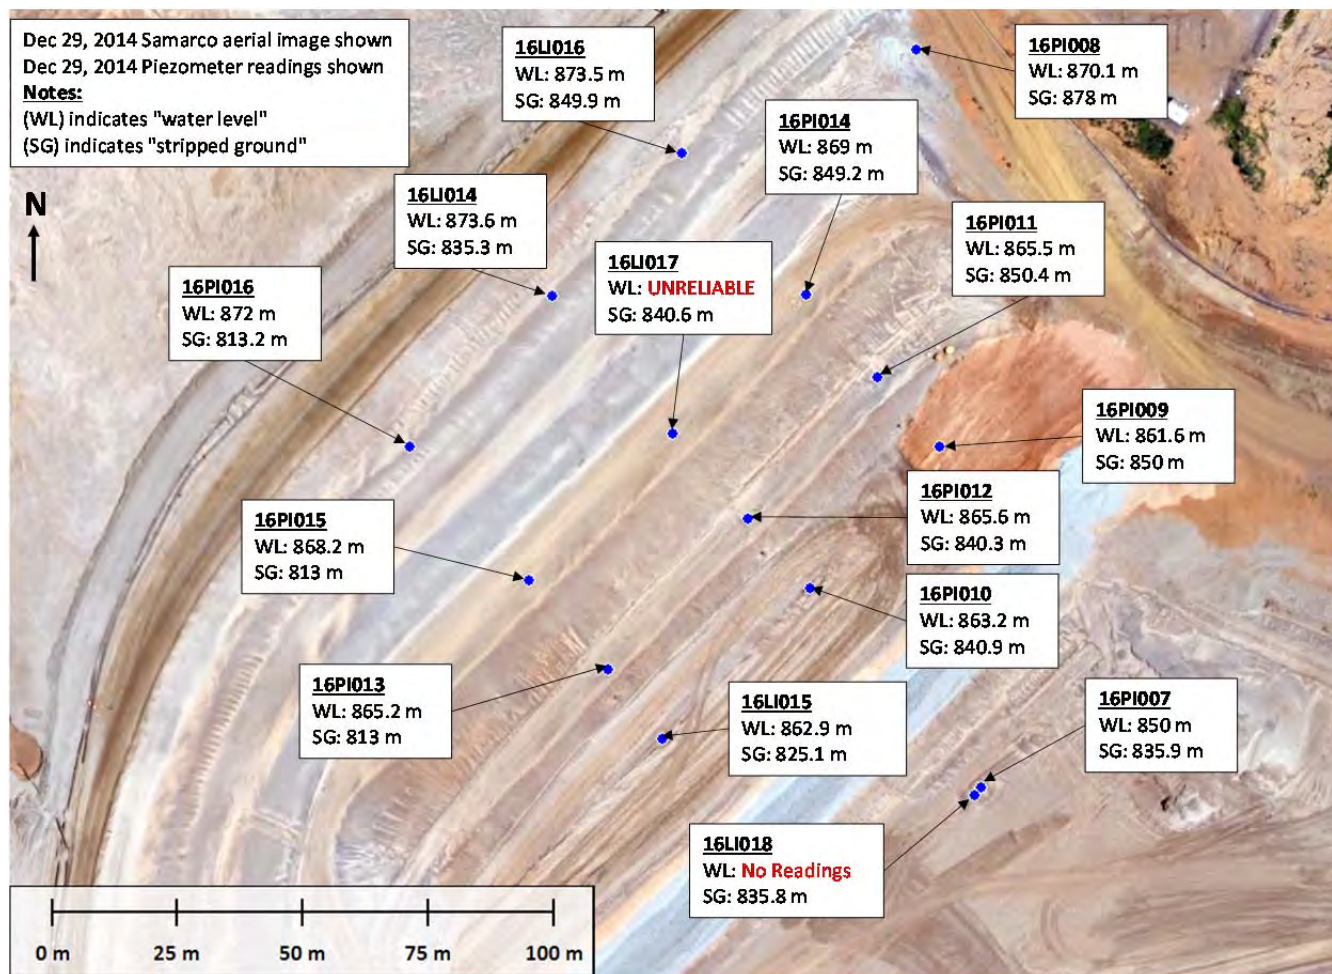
Piezometric readings and stripped ground elevation at setback in December, 2014
